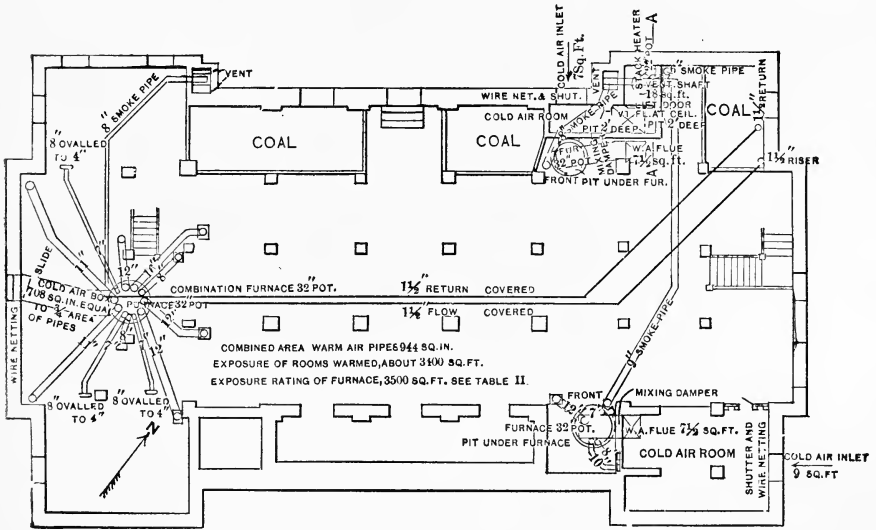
Furnace System of Heating and Ventilating a Town Hall.—Basement Plan.
